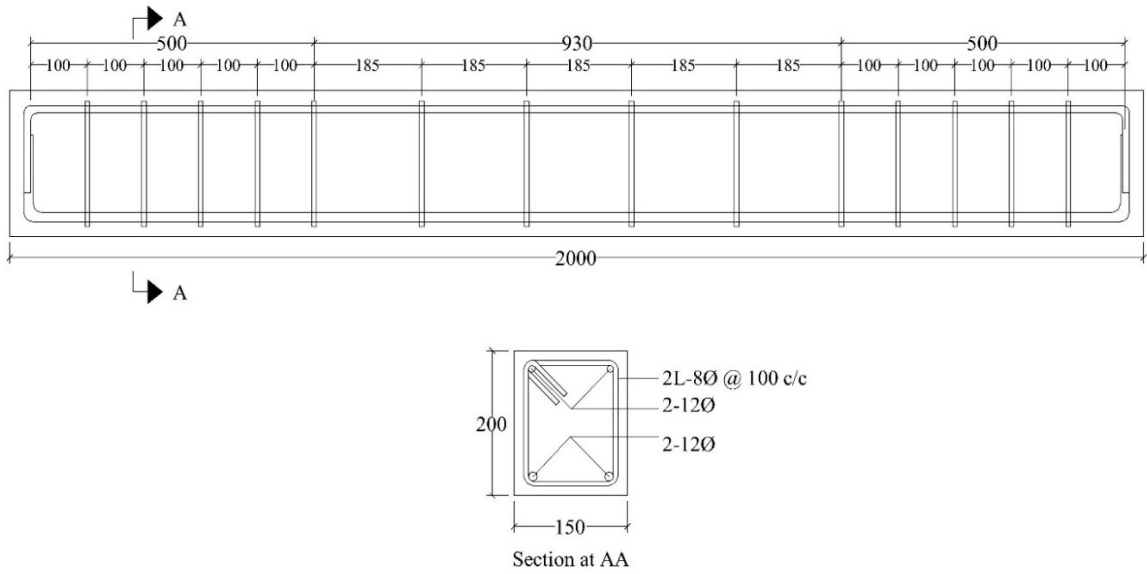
Reinforcement details in the beam (*All dimensions are in mm*).
